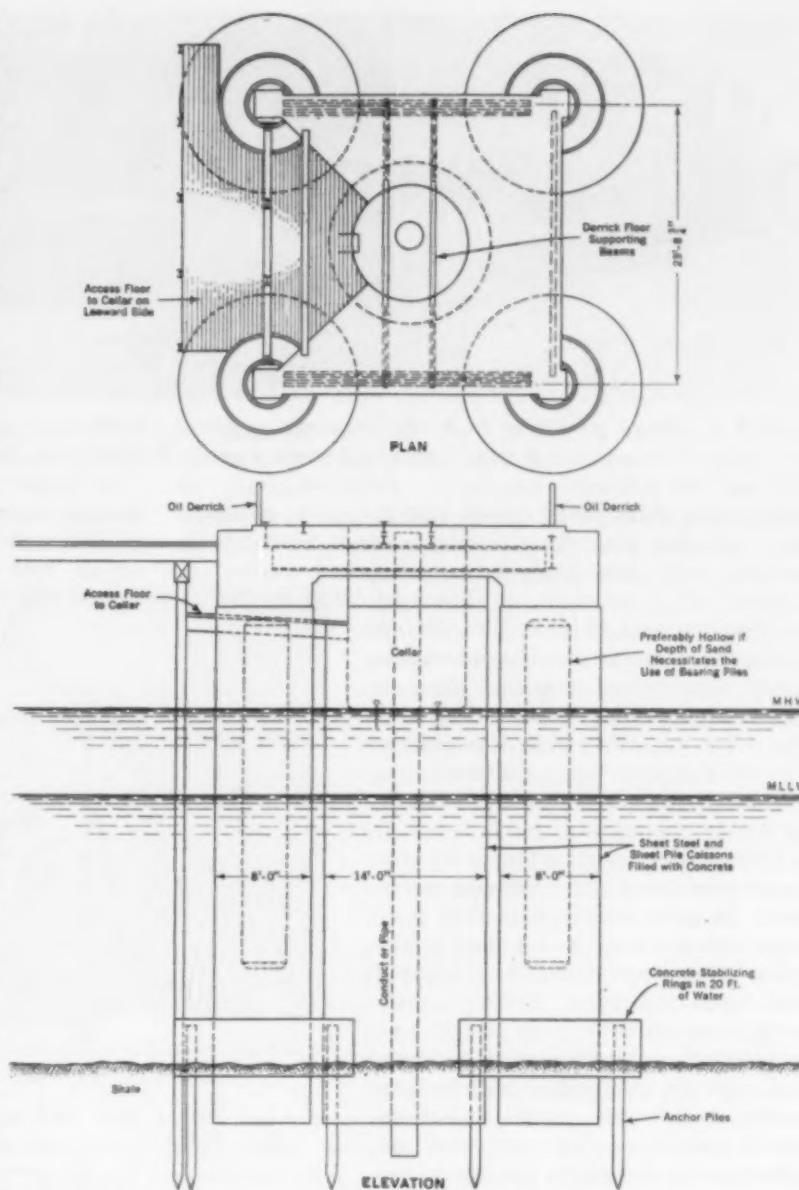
MONOLITHIC FIVE-LEG FOUNDATION OF REINFORCED CONCRETE Suitable for the Breaker Line
